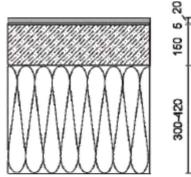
Hannover passive house floor slab cross section (Heiduk, 2009)
